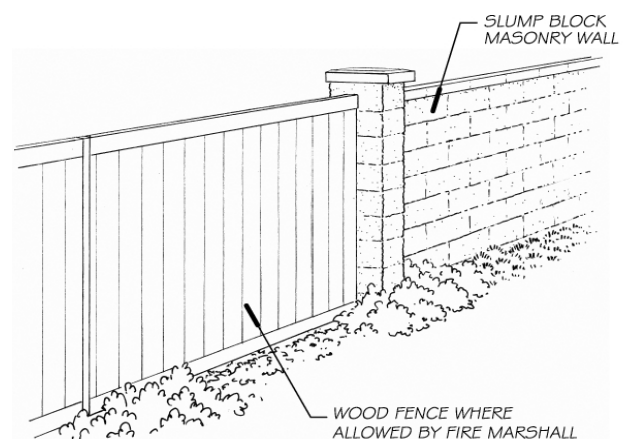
Typical Solid Theme Fence/Wall
